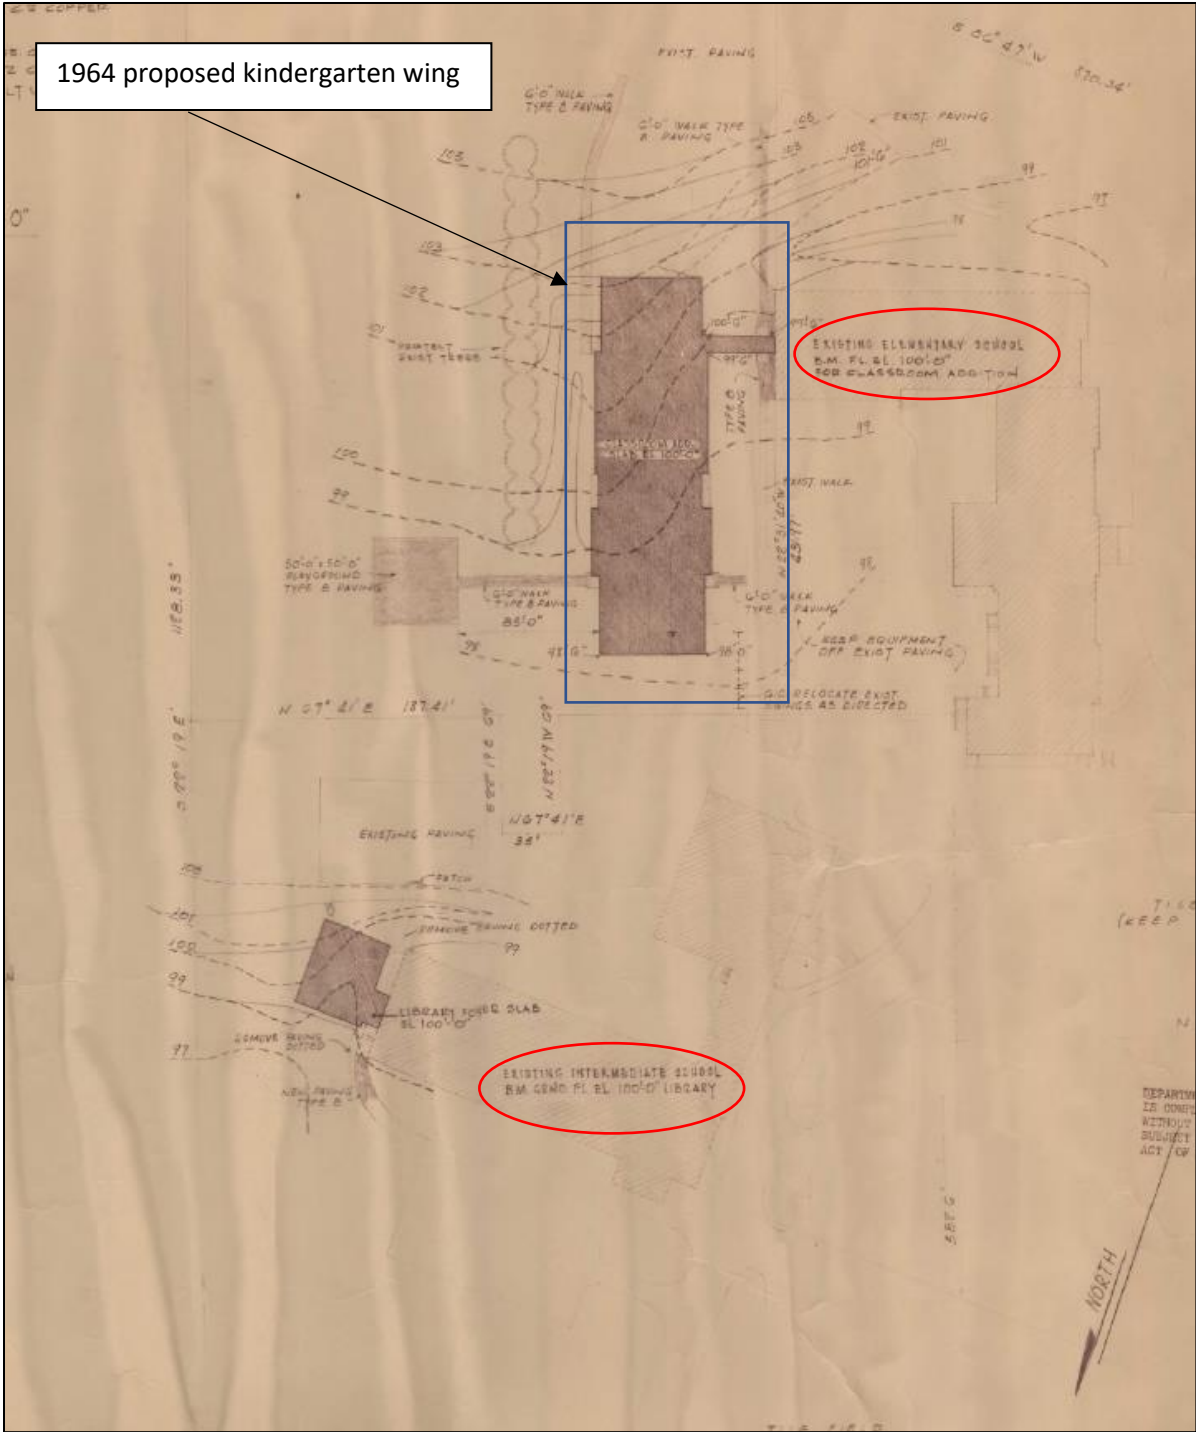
Architectural drawings of Fridtjof Tobiessen office, plot plan of kindergarten wing showing existing buildings, additions to the East Whiteland Intermediate/Elementary School (as stated on the drawings), 1964. (provided by Great Valley School District)
